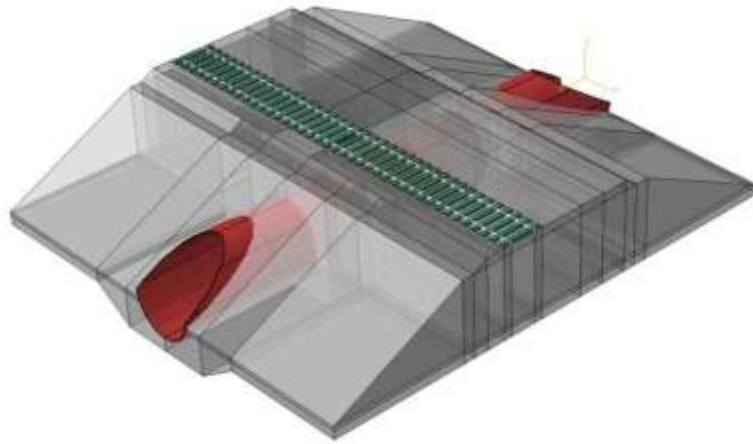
Example of soil-steel flexible railroad culvert from corrugated sheet 3D model [1]
